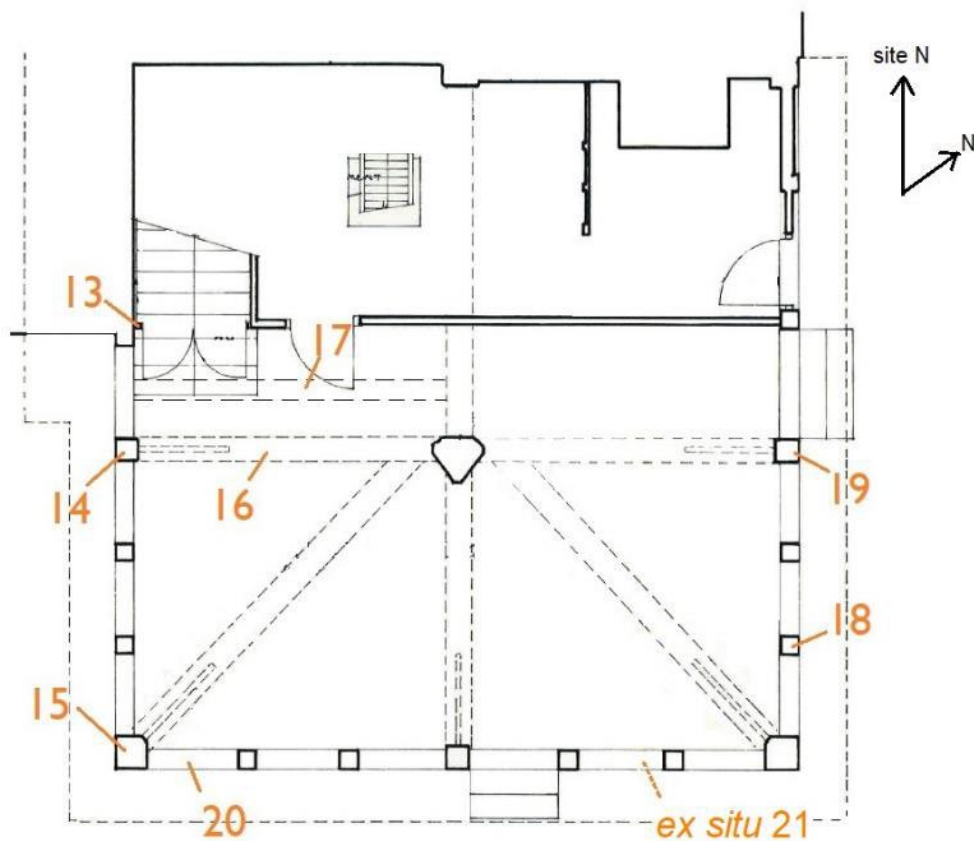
Ground-floor plan, showing positions of the timbers sampled for dendrochronology (adapted from Essex County Council plans drawn by R Crowe, 1974)
